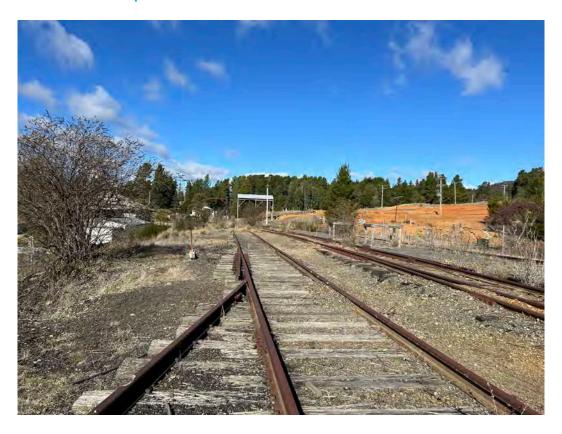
Former Loadout Facility and Weigh Bridge. No airborne dust was visible on site. Facing south-west.
